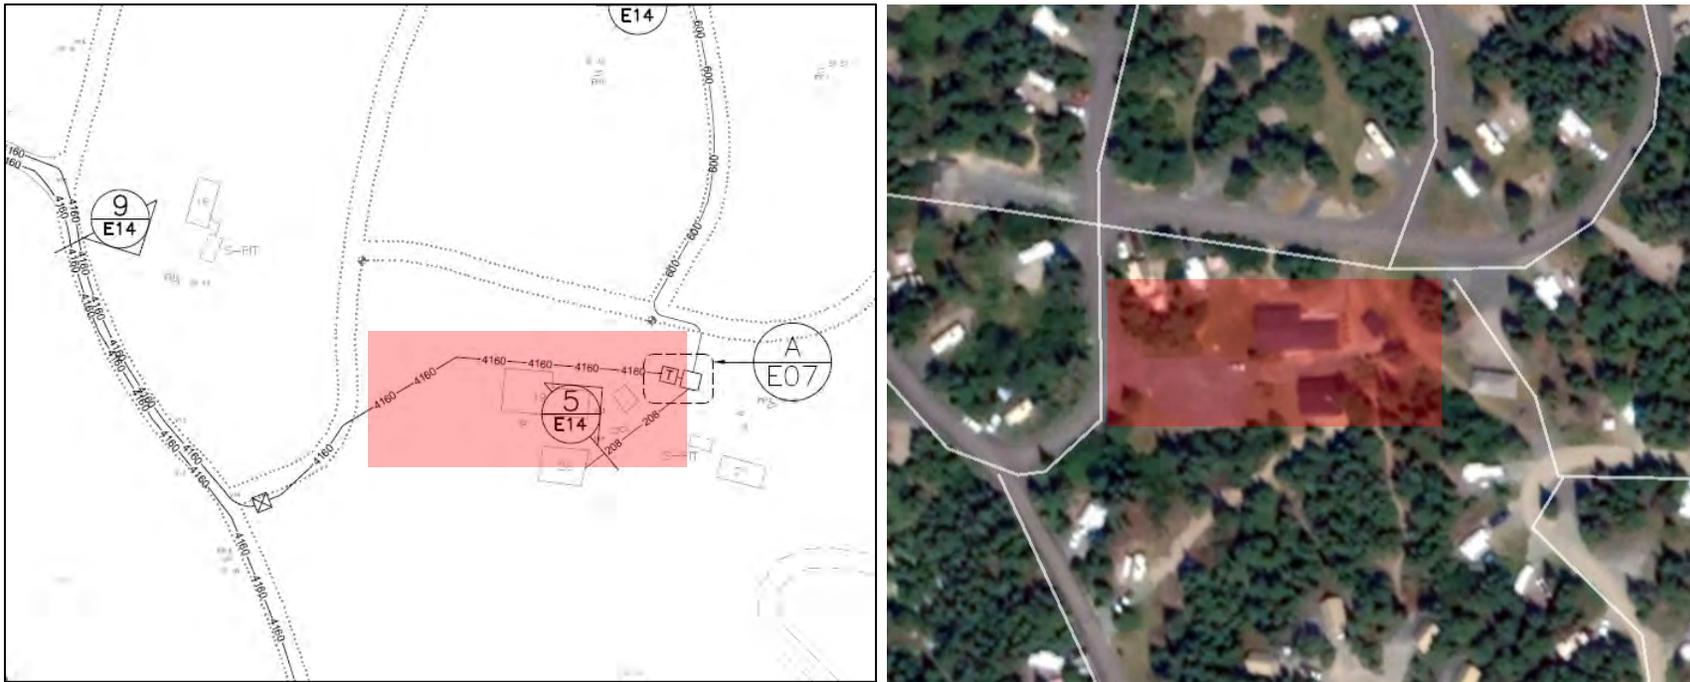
Newman Sound Campground Underground Electrical Primary Recapitalization. Left: Area in Sheet E07 showing the installation of new underground cable outside existing roadway. Right: Google Earth image of same area showing the approximate location of project activity area (Crandall 2019c).
